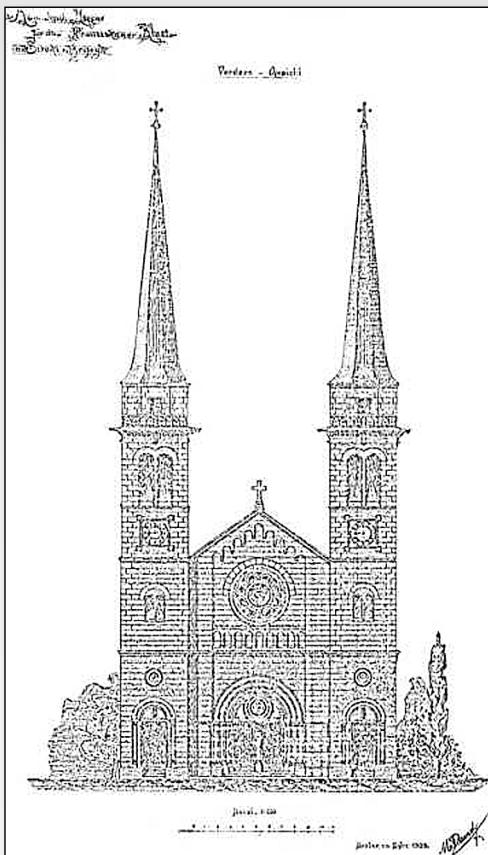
M. David - The First Plan for the New Church in Široki Brijeg, March 1904
